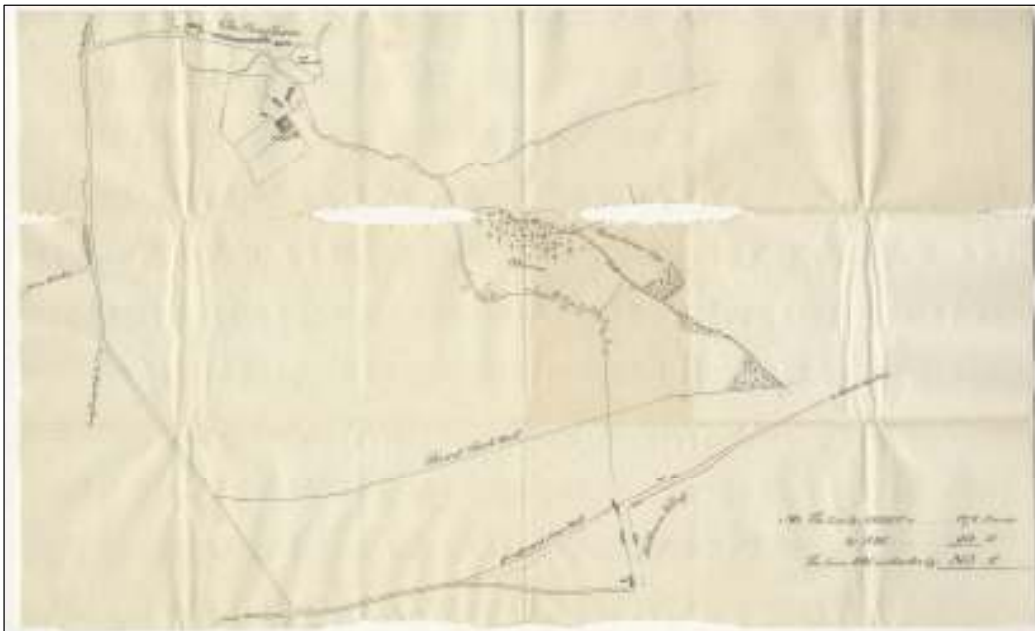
Eighteenth century plan of proposed extension to southern boundary wall. New line of wall is marked in red
